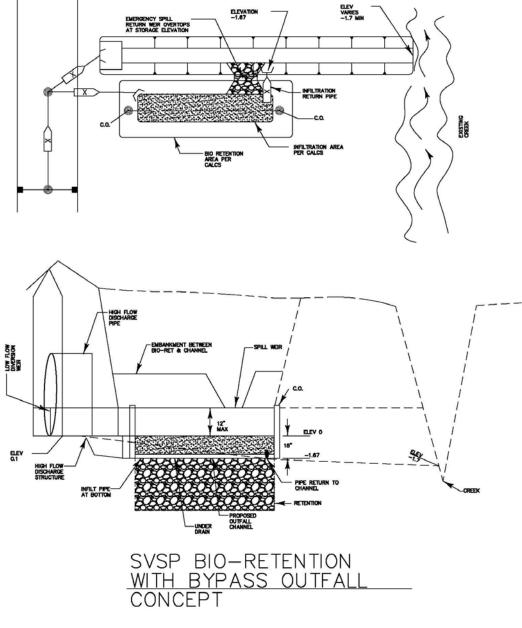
Vegetated Swale Outfall with Bypass Detail
